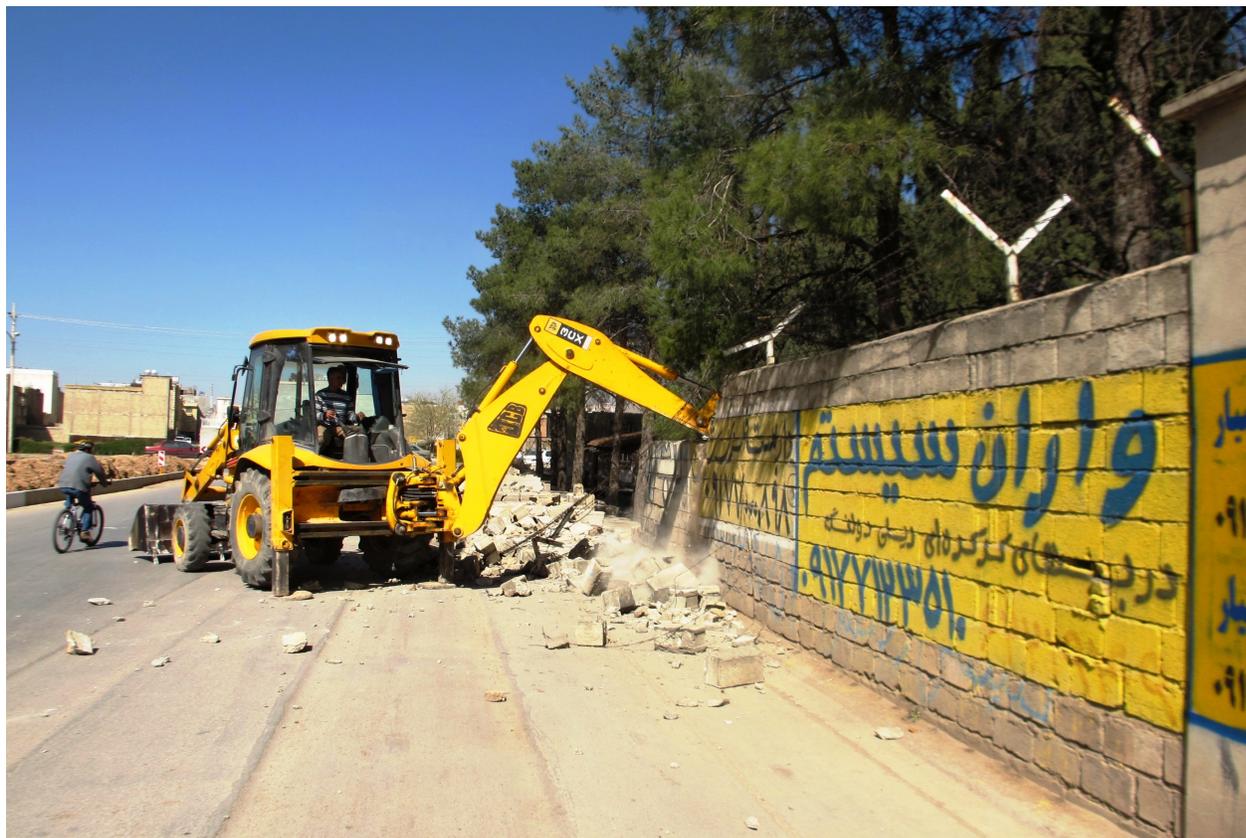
Demolition of the wall around Janat Garden to widen the road in Shiraz (Shiraz Municipality<sup>49</sup>)
